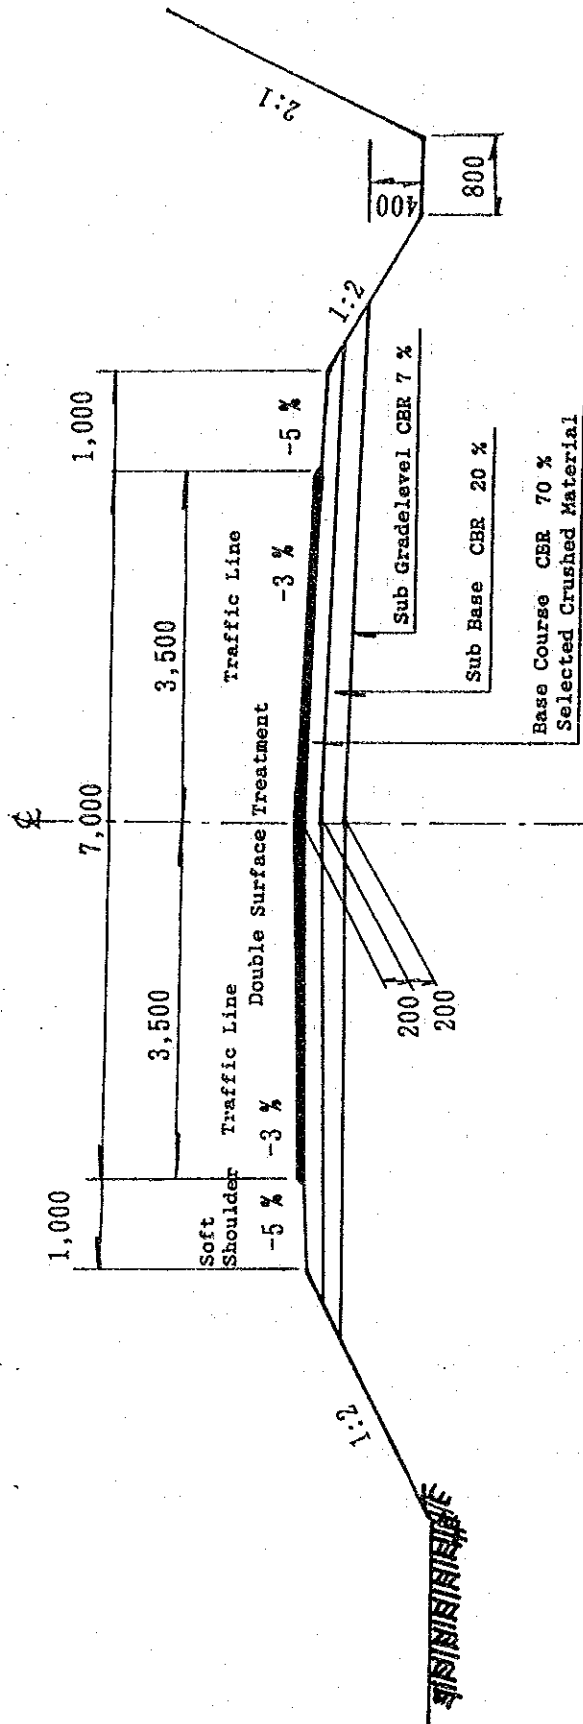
CROSS-SECTION IN CUT AND ON FILL
